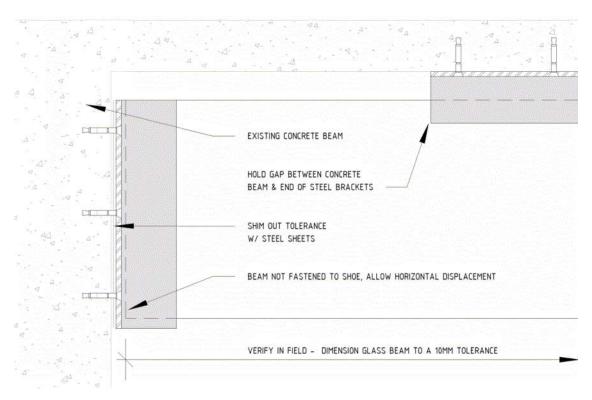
Elevation detail at end of glass beam to existing concrete beam
